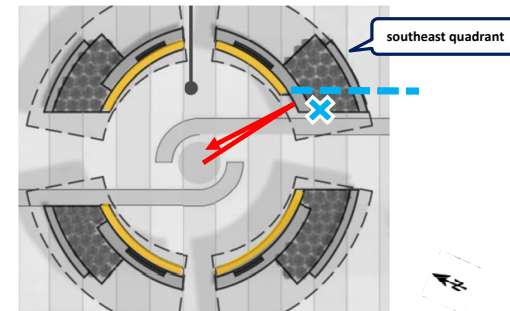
Comments for 12-Dec-2022 Concept Plan Southeast Quadrant
